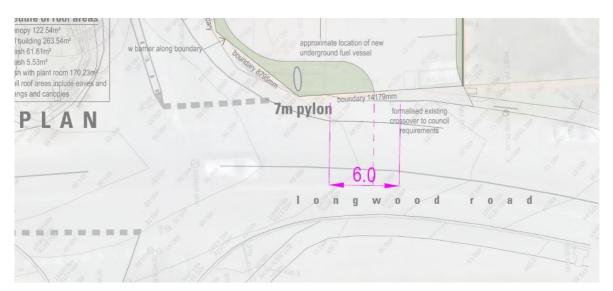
Proposed Longwood Road access relative to the prohibited access zone for the Longwood Road/Scott Creek Road intersection, as defined in Figure 3.3 of AS/NZS2890.1:2004
